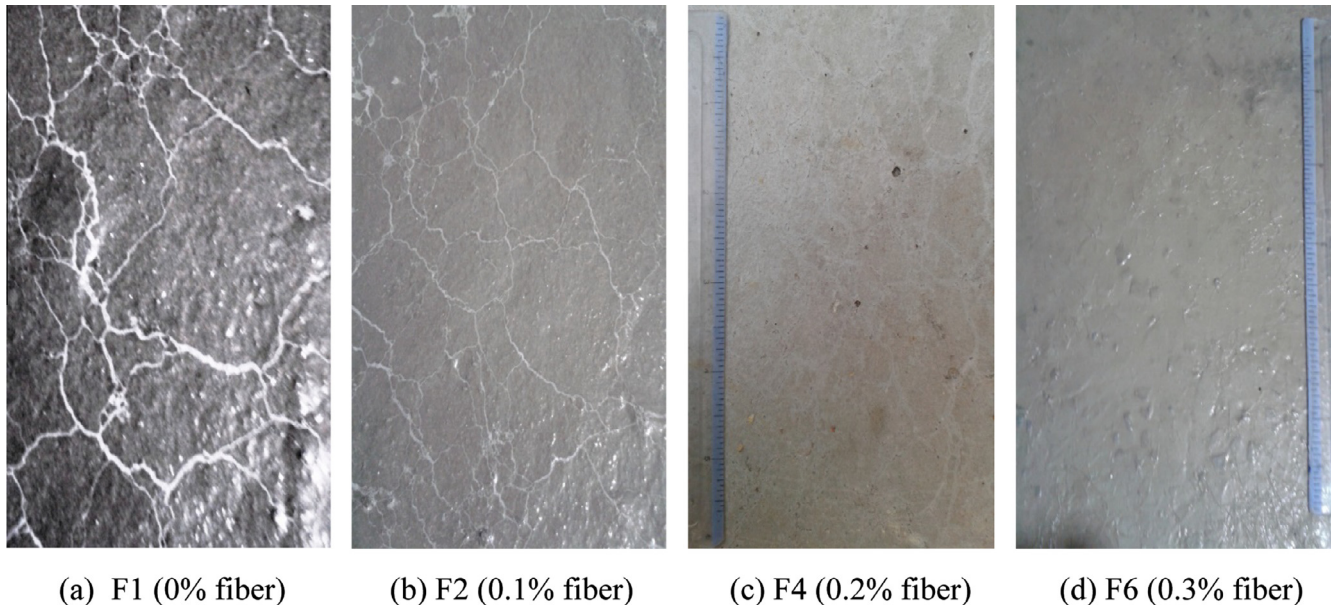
Shrinkage crack in concrete slabs (area covered $6.0'' \times 4.5''$).
